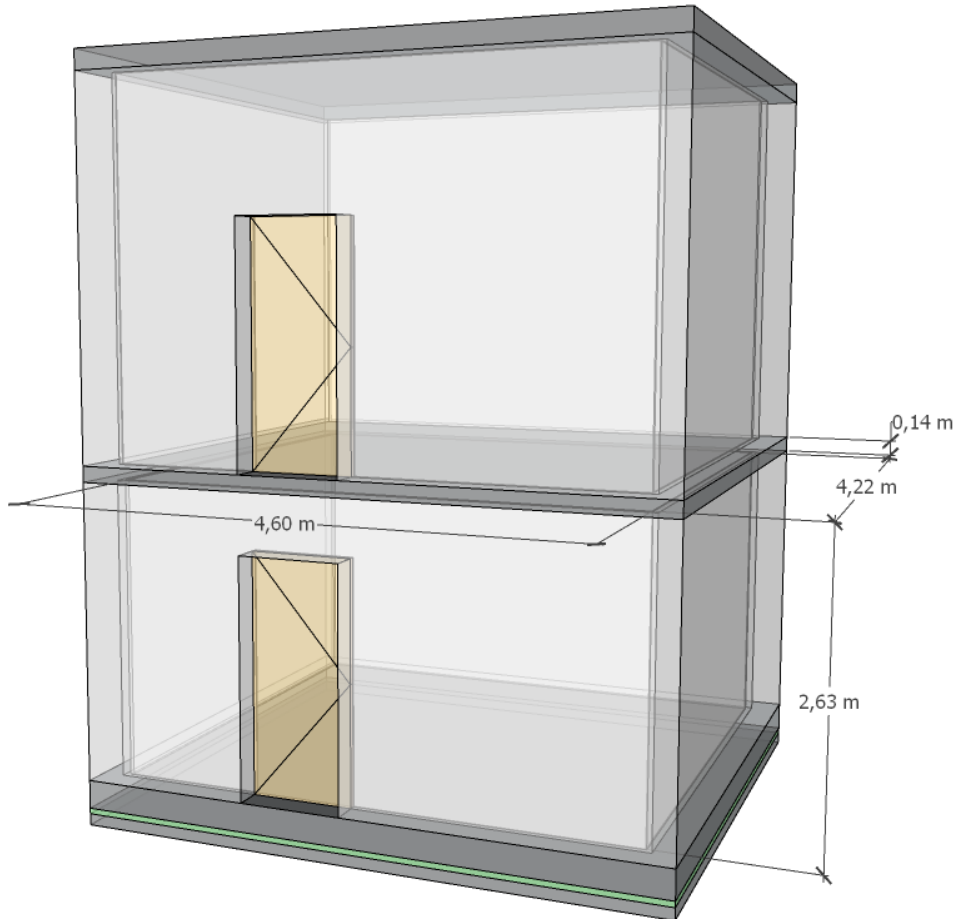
Schematic representation of the floor test facility representing a building-like situation in heavyweight buildings.
